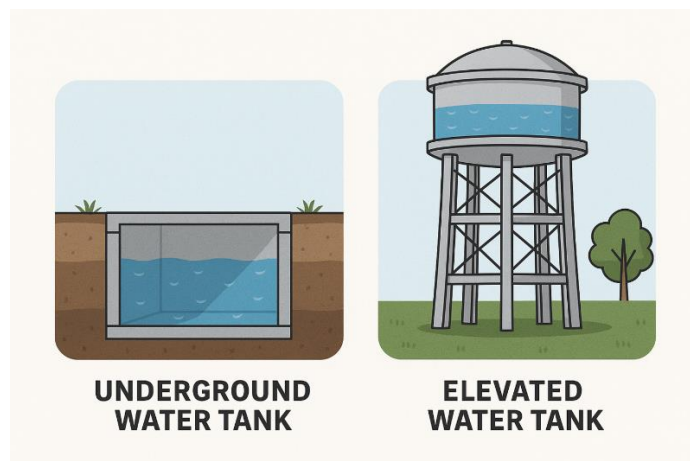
Typical configuration of underground (left) and elevated (right) RCC water tanks.
